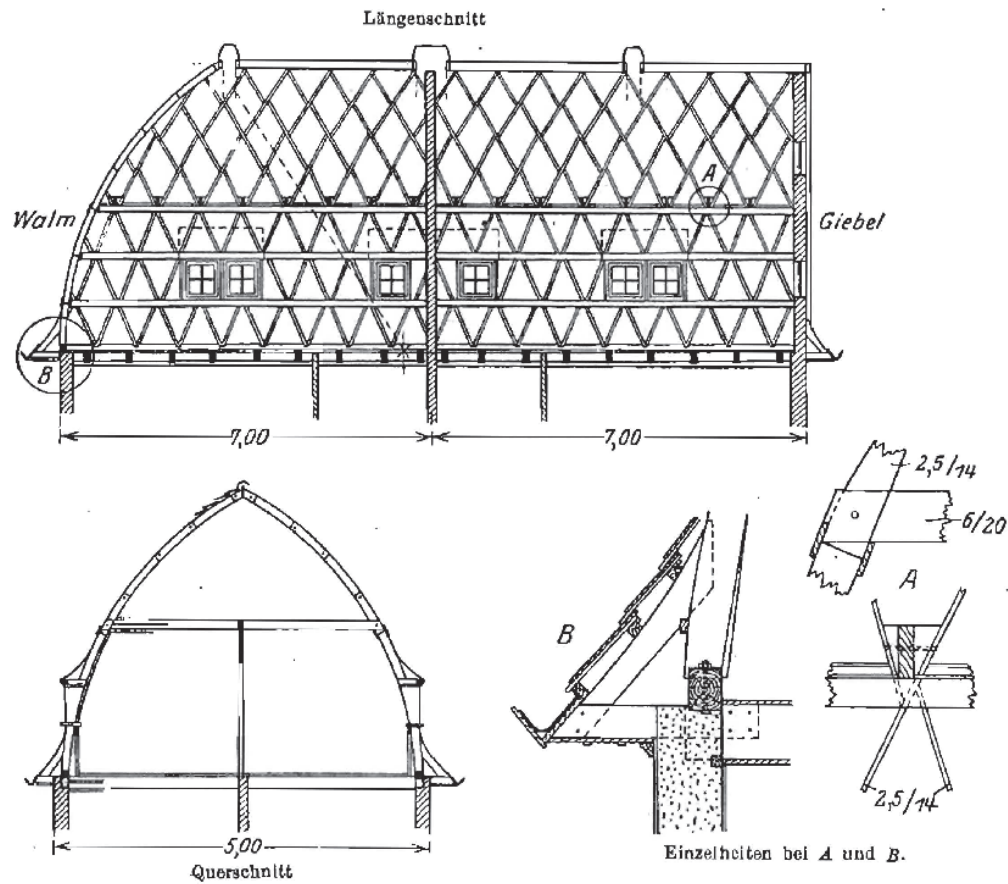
Lamella Roof Using the Zollbau Method [6].
